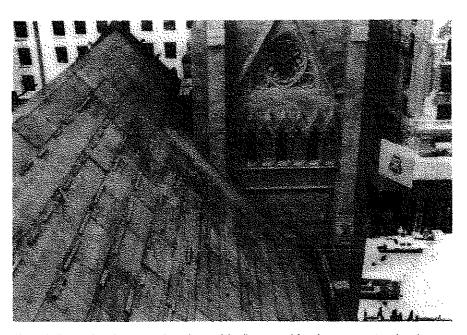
Dropped equipment, tools, and materials all present risks when new construction rises above neighboring historic structures. In this case, the historic slate roof was completely covered with sheets of exterior grade plywood. Photo: National Park Service files.
